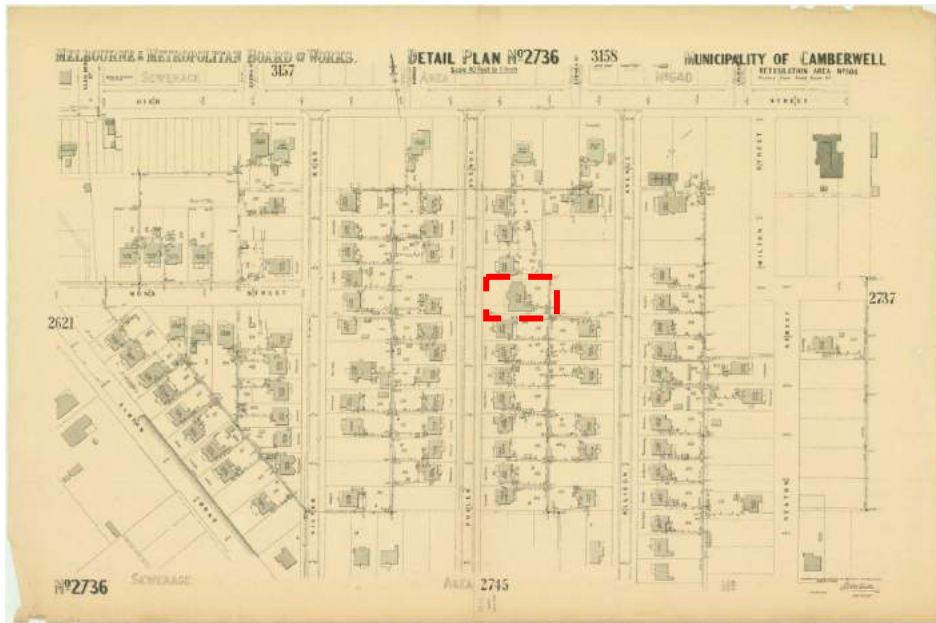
MMBW Detail Plan 2736, Municipality of Camberwell, 1927 (Source) SLV).
